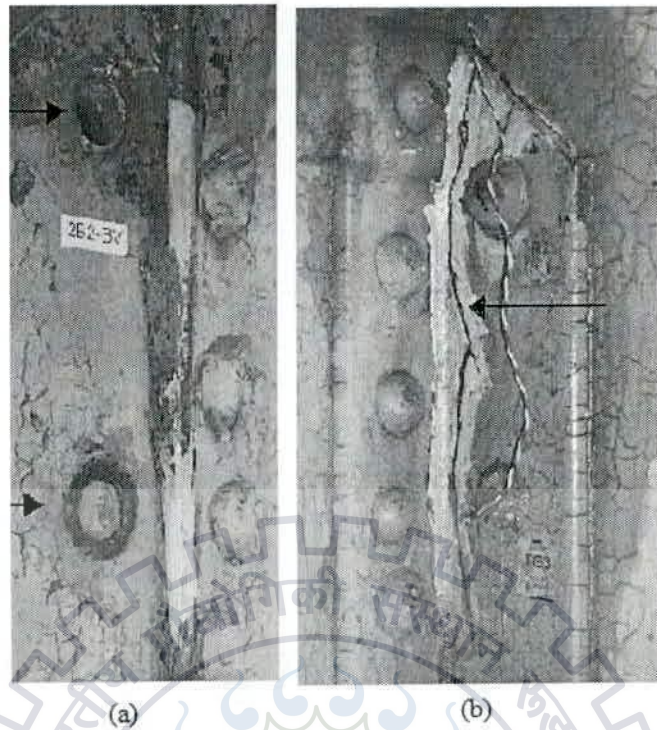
(a) Complete loss of rivets due to failure of rivet shank. (b) Crack propagating in a connection angle (Haghani, et al., 2012)
